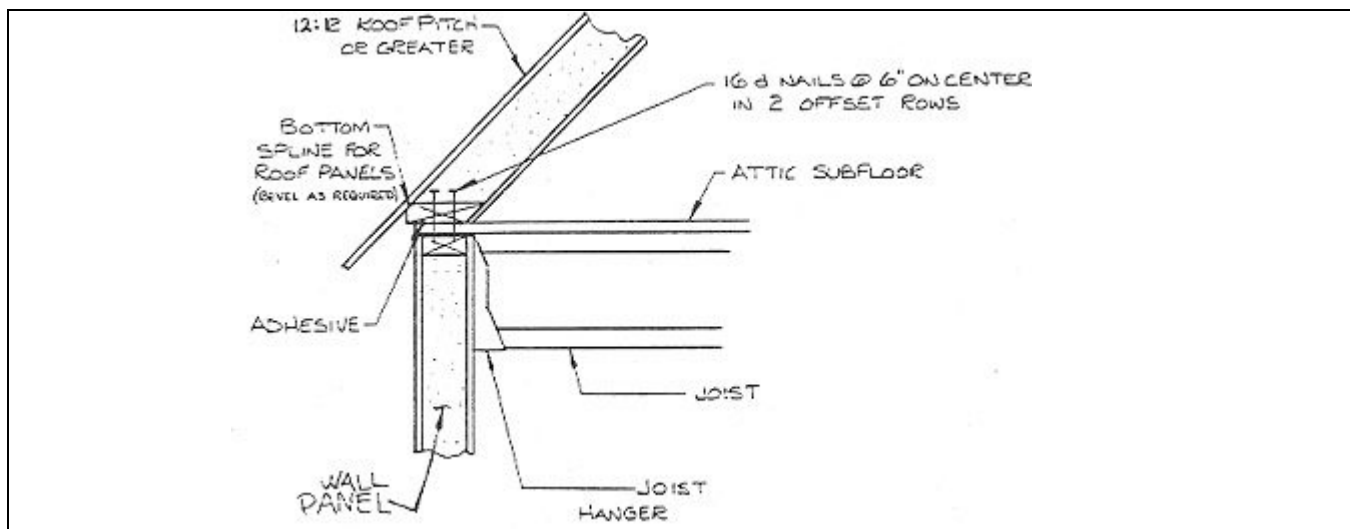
Installing Bottom Spline for Roof Panels: With roof pitches steeper than 12:12, a specially cut bottom spline is used at the eaves to secure the roof panels to the top floor deck or walls.
